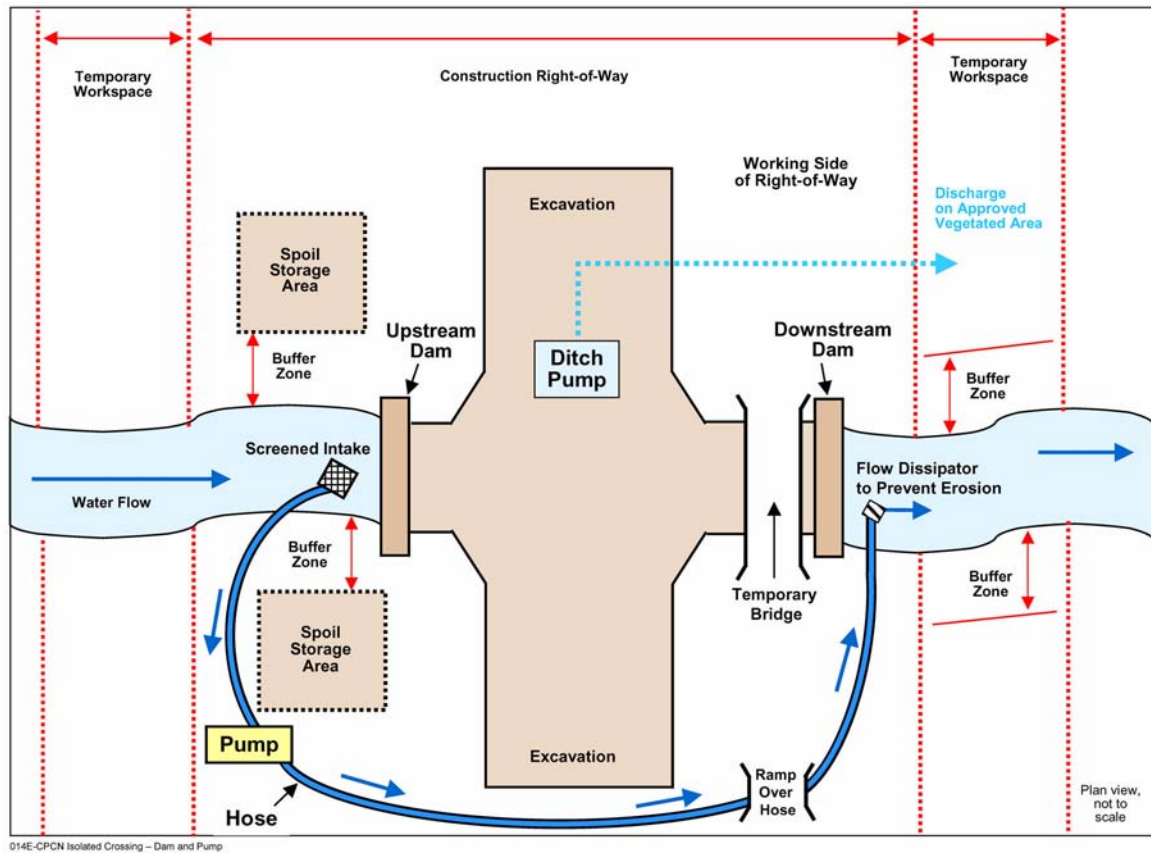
Typical Isolated Crossing – Dam and Pump
